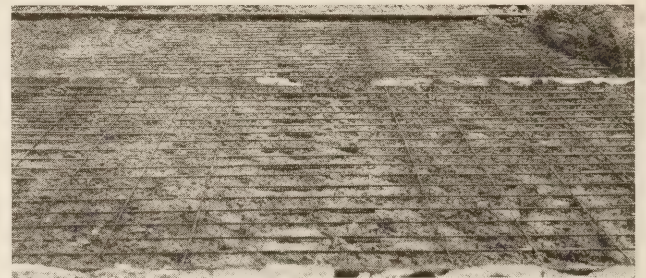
SHEAR DOWEL BARS IN PLACE AT LOCATION WHERE WEAKENED-PLANE JOINT IS TO BE FORMED.
